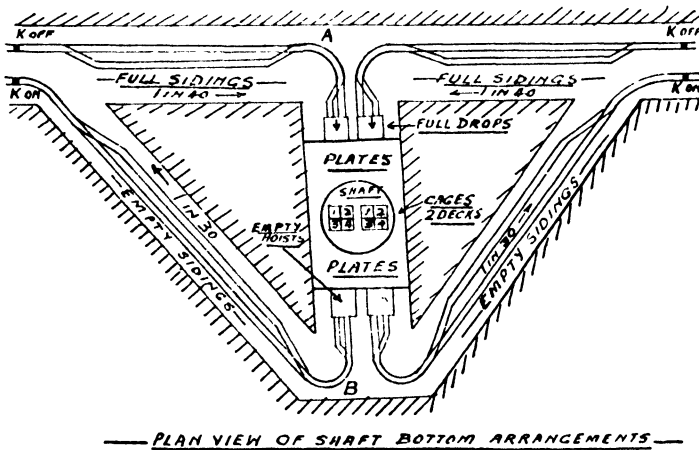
Shaft Bottom and Cage-decking Arrangements.
